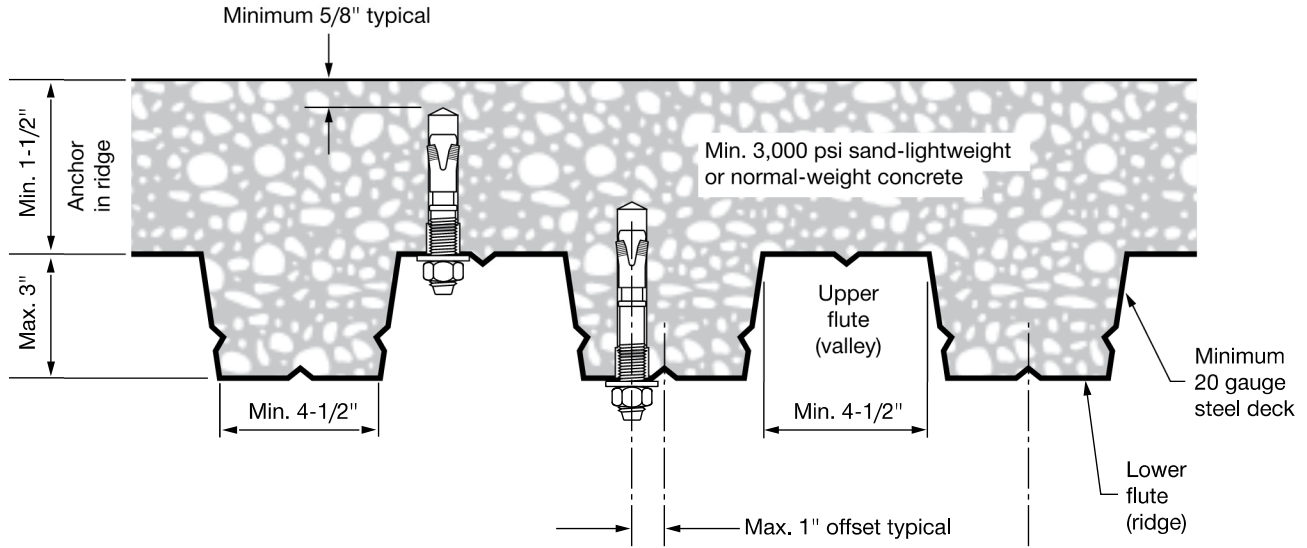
Installation of KWIK Bolt TZ in the soffit of concrete over metal deck floor and roof assemblies - W Deck
